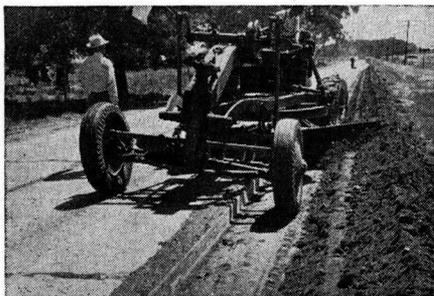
Excavating for Widening with Motor Grader Having Auxiliary Mould Board Attached to the Regular Mould Board.
